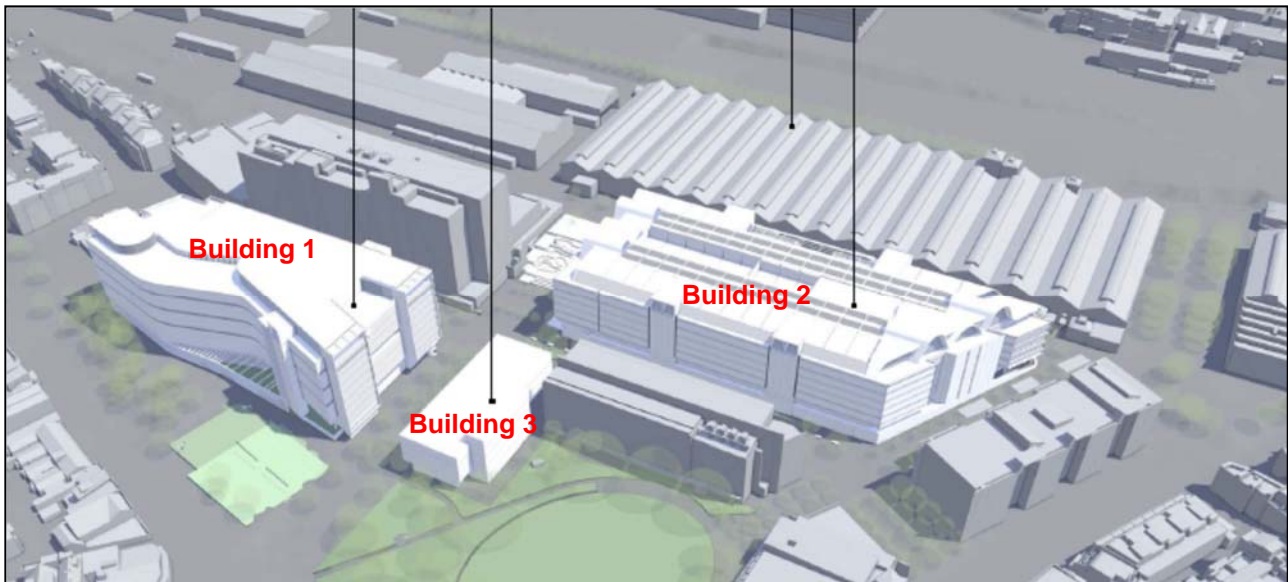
Proposed site plan for the ATP (Source: applicant's EIS)
